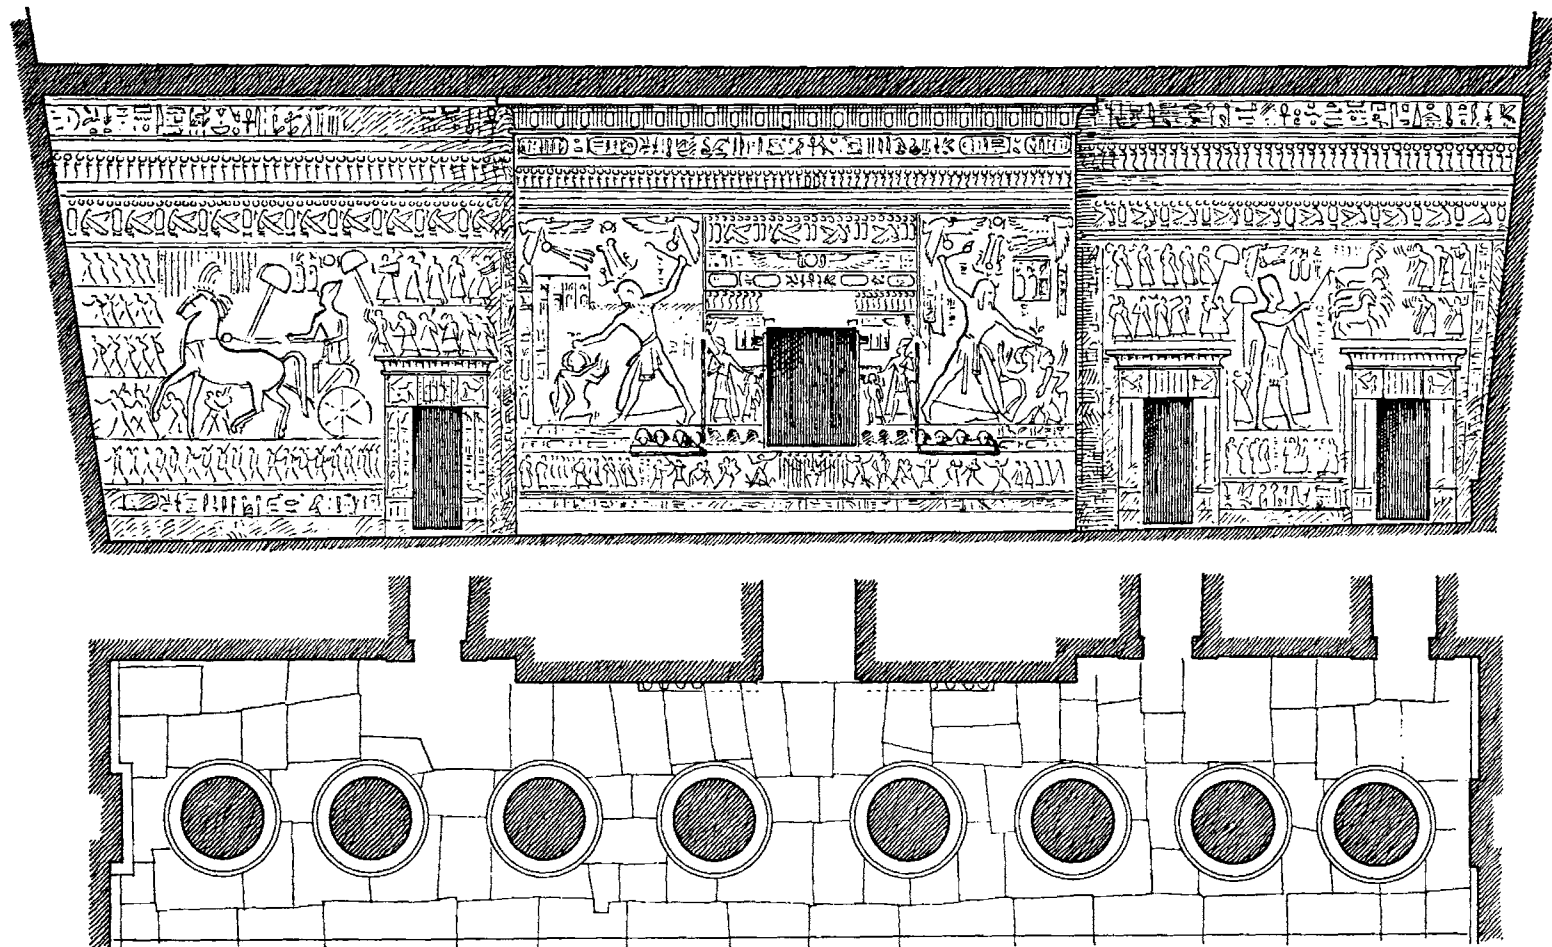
FAÇADE OF THE ROYAL PALACE AT MEDINET HABU AND GROUND PLAN OF ITS COLUMNED PORTICO
